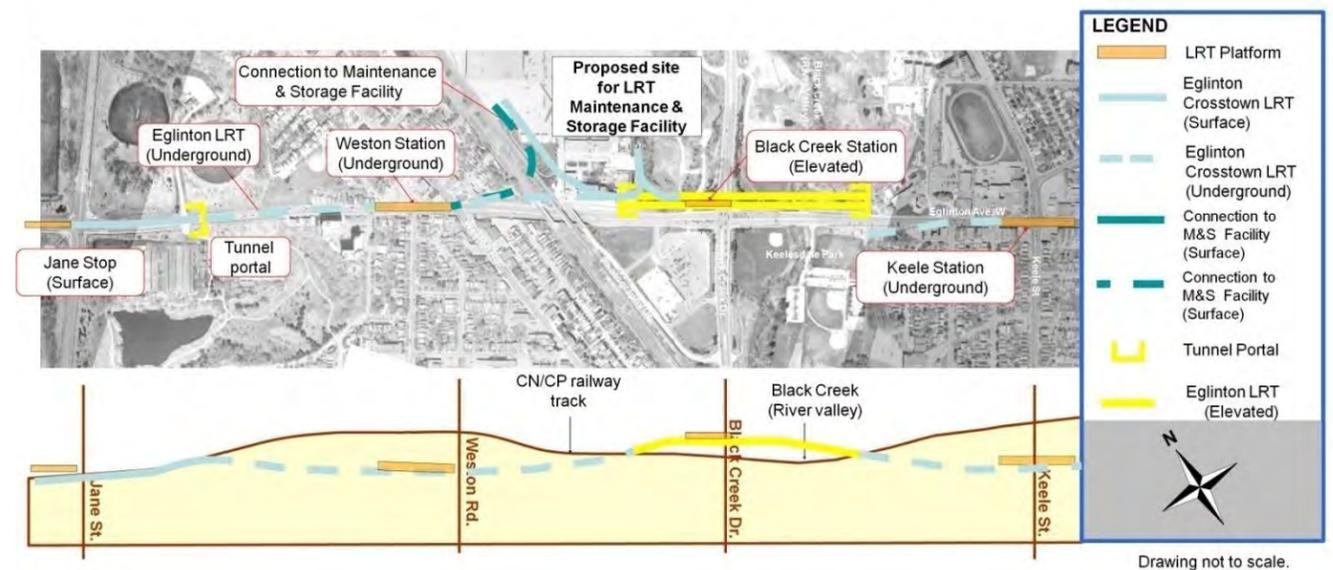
Option 3 – Elevated North Side Alignment - Plan and Elevation
